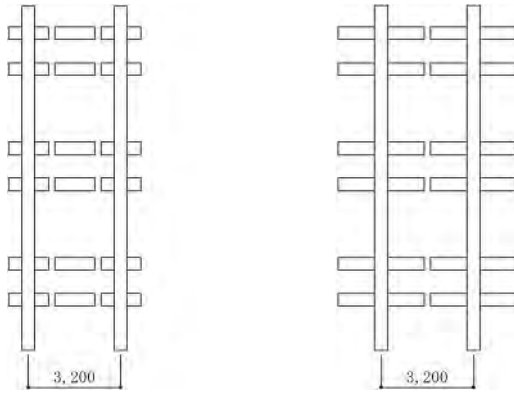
Steel Column and Beams (Left: conventional brackets and beams, Right: long brackets).
